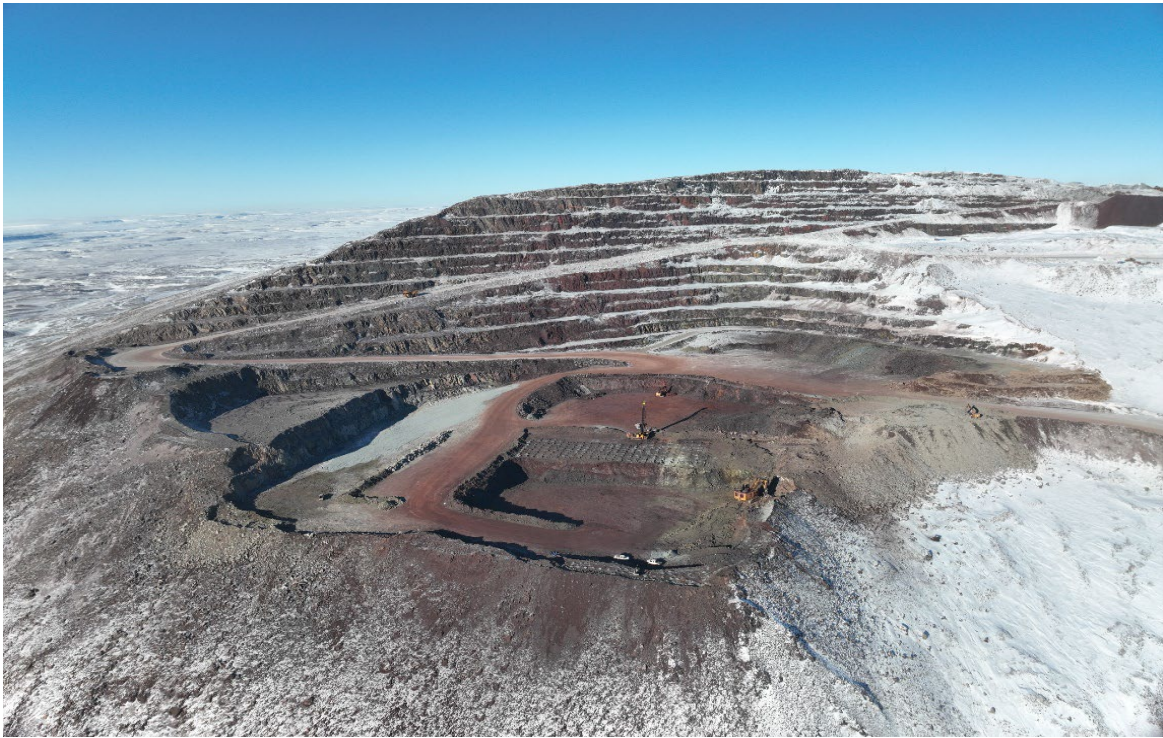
Drilling Blast Pattern in Nuluujaak Pit - March 2024
